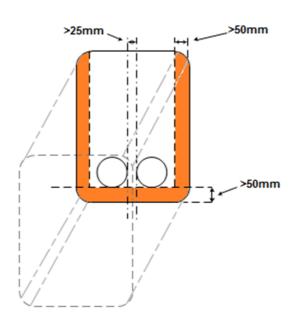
Sketch Of Pit Showing Minimum Conduit Entry Spacings
